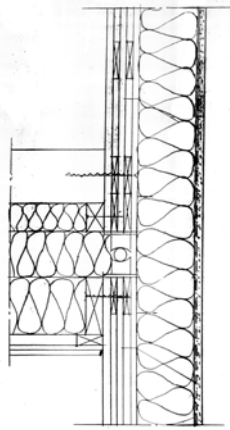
Principle vertical section through the wall-floor joint zone in Vetenskapsstaden I.
